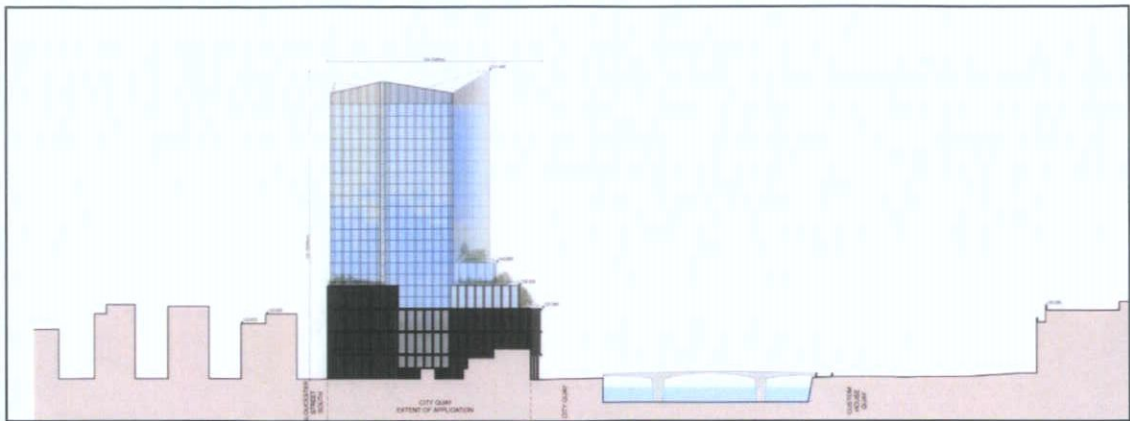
North Elevation (Mahoney Architecture 2022)
